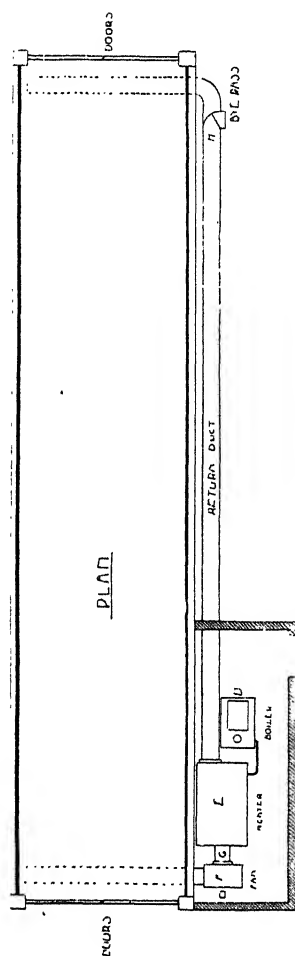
Wells' Timber-drying apparatus with positive circulation. Plan.
